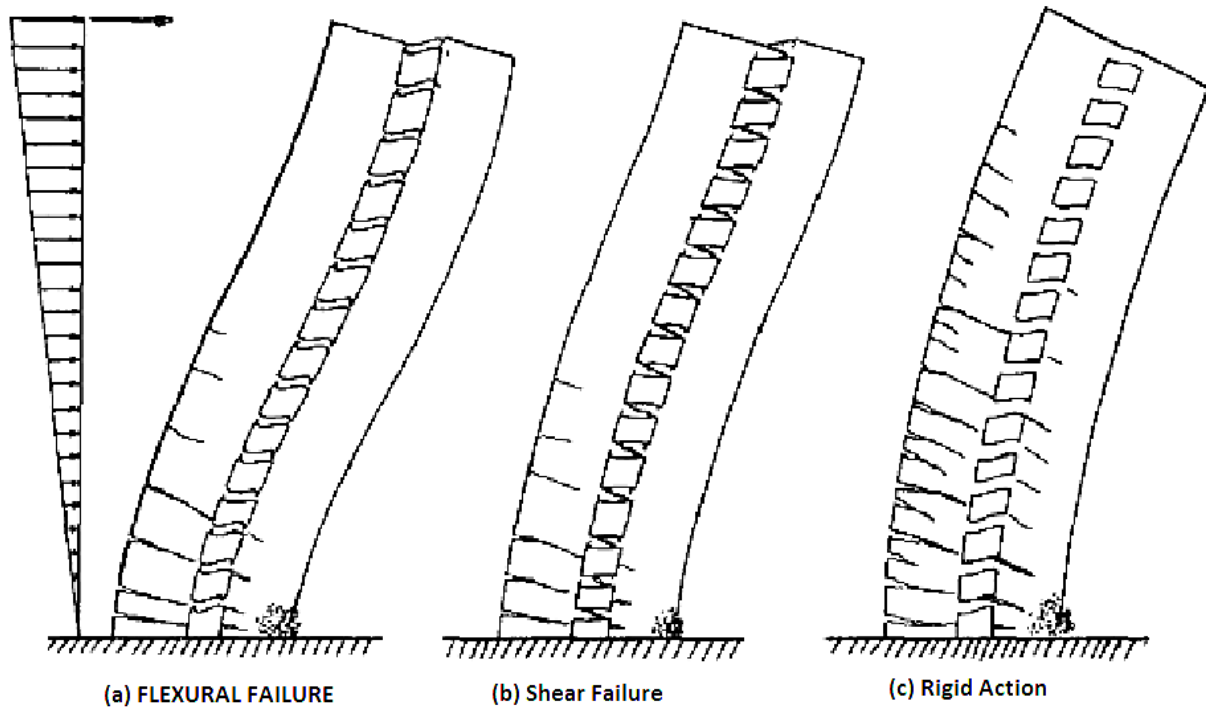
Failure modes of coupled shear wall under lateral load (Subedi 1991)
